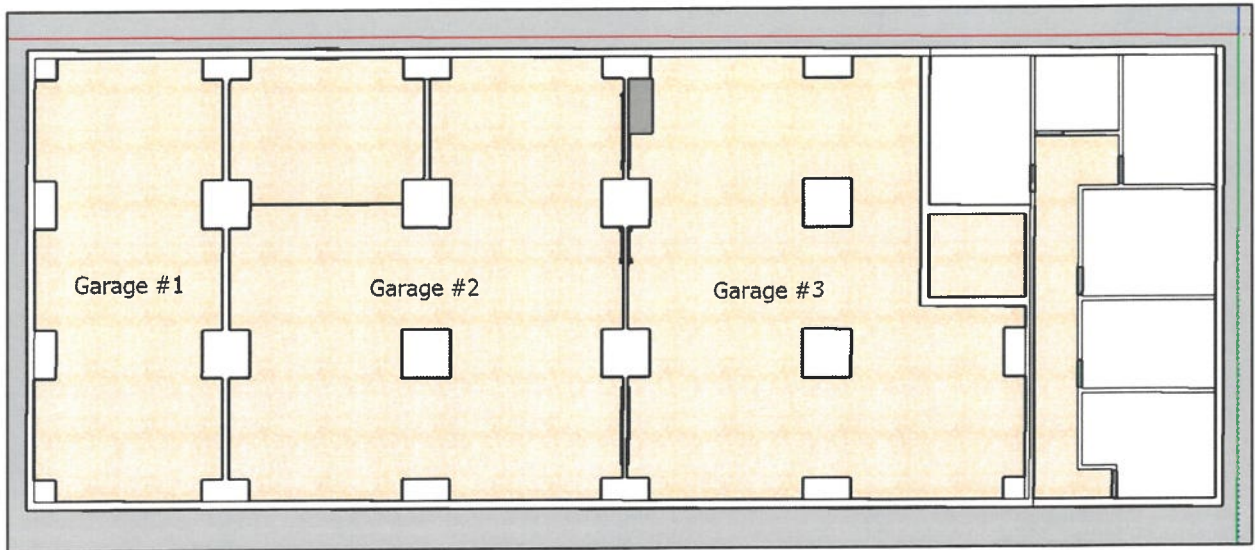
Top-Down View of Building 502 showing floorplan layouts of Garage Bays #1, #2, and #3, and the office suite.
